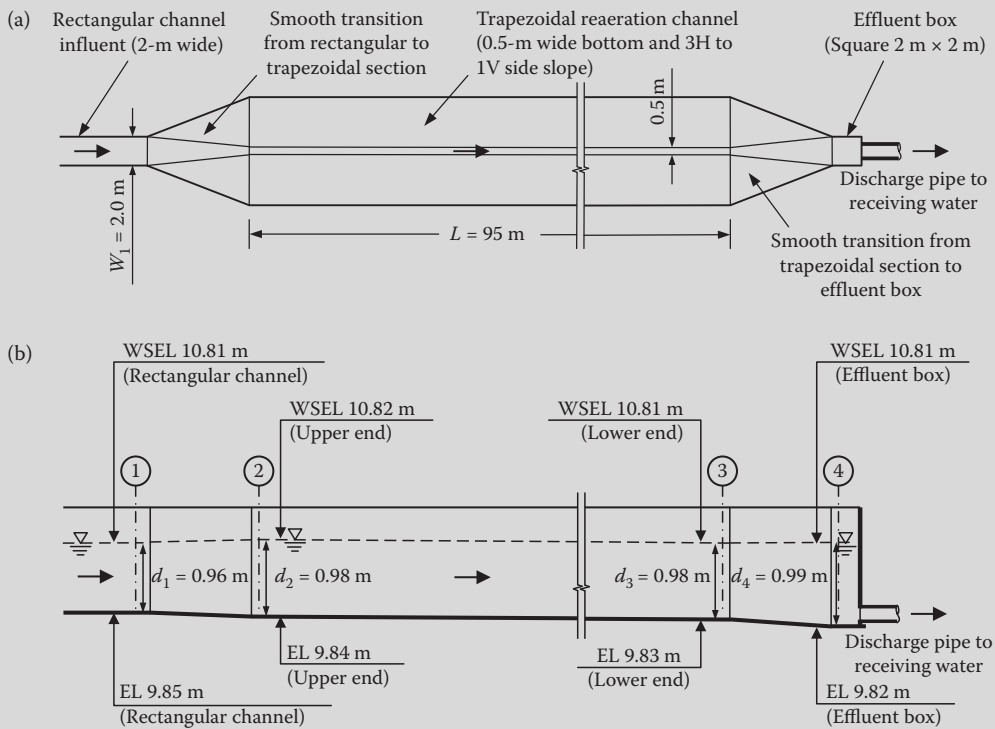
Sketches of post re-aeration channel: (a) plan, and (b) longitudinal section (Example 14.5).
